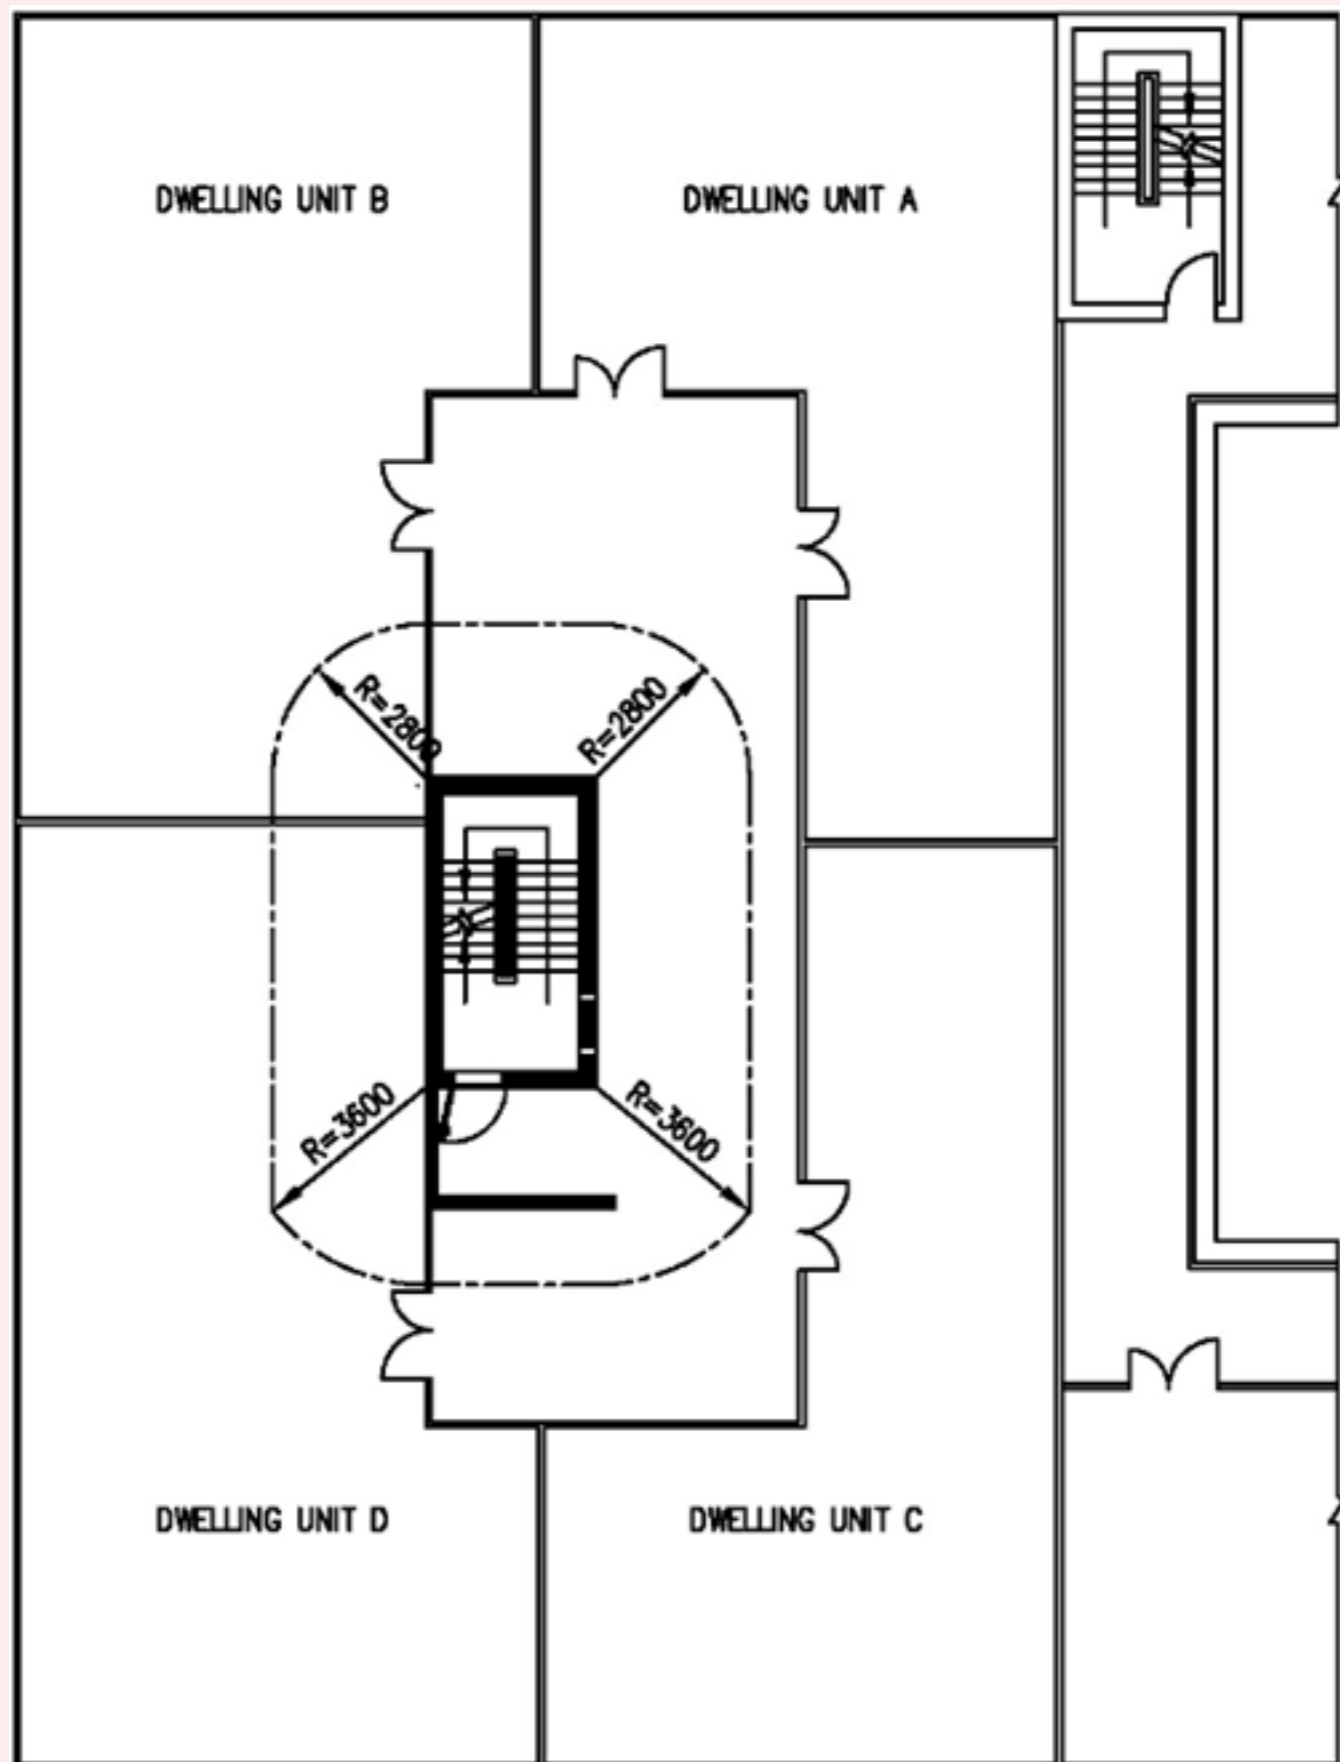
(c): SETBACK DISTANCE OF SS WALLS (WITHOUT DOWN-HANG BEAM)
